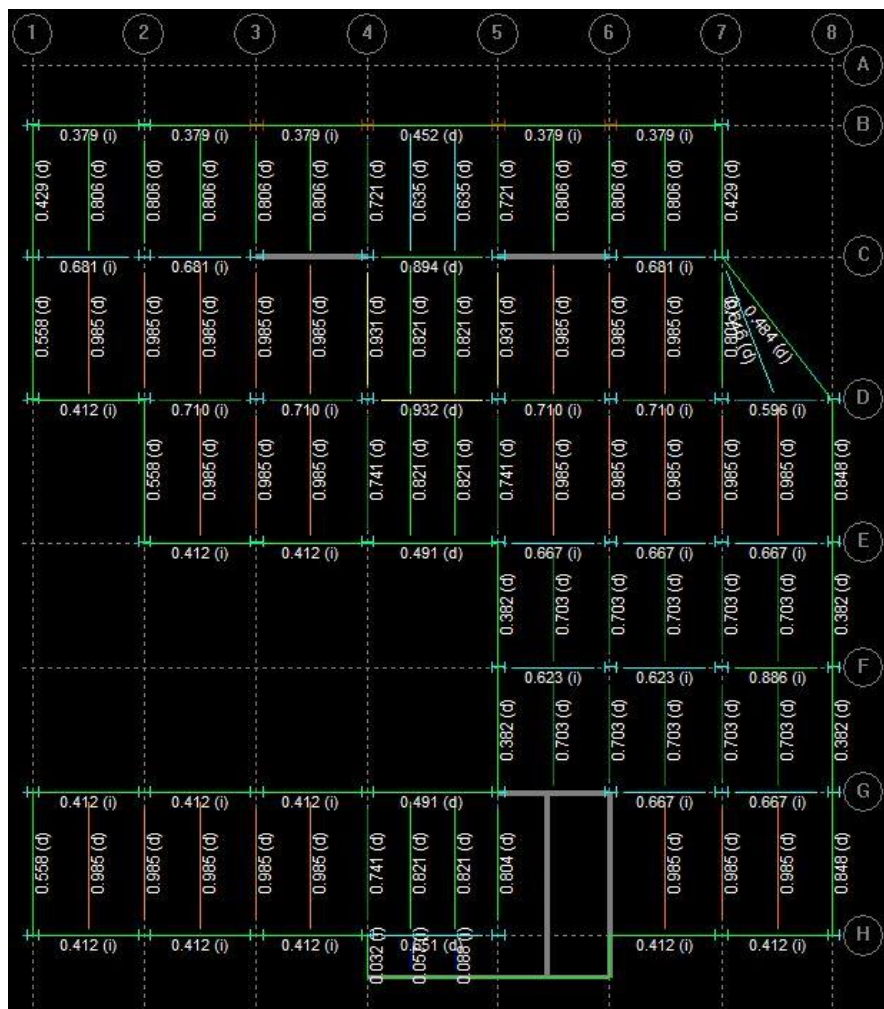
16<sup>th</sup> Floor Steel Utilization
